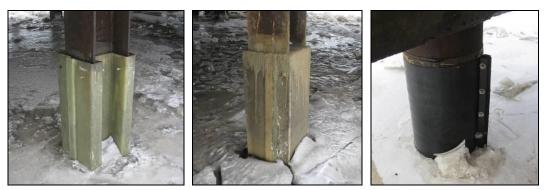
H-Shaped, Rectangular, and Pipe Pile Protective Systems
